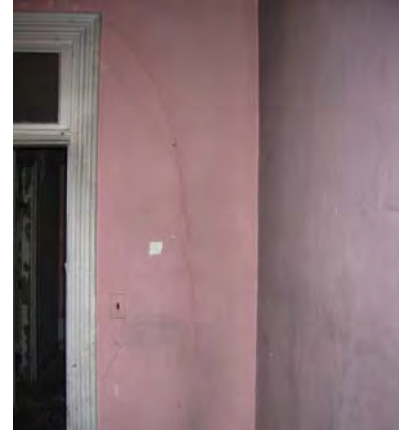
Major crack in plaster by door D302. (Photo: BBB, 2007)
